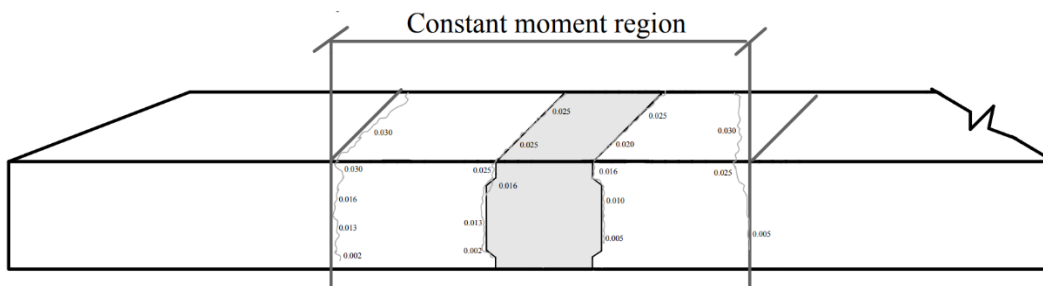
Crack Propagation for Proprietary Long-Term Specimen at 60 % of Final Load
